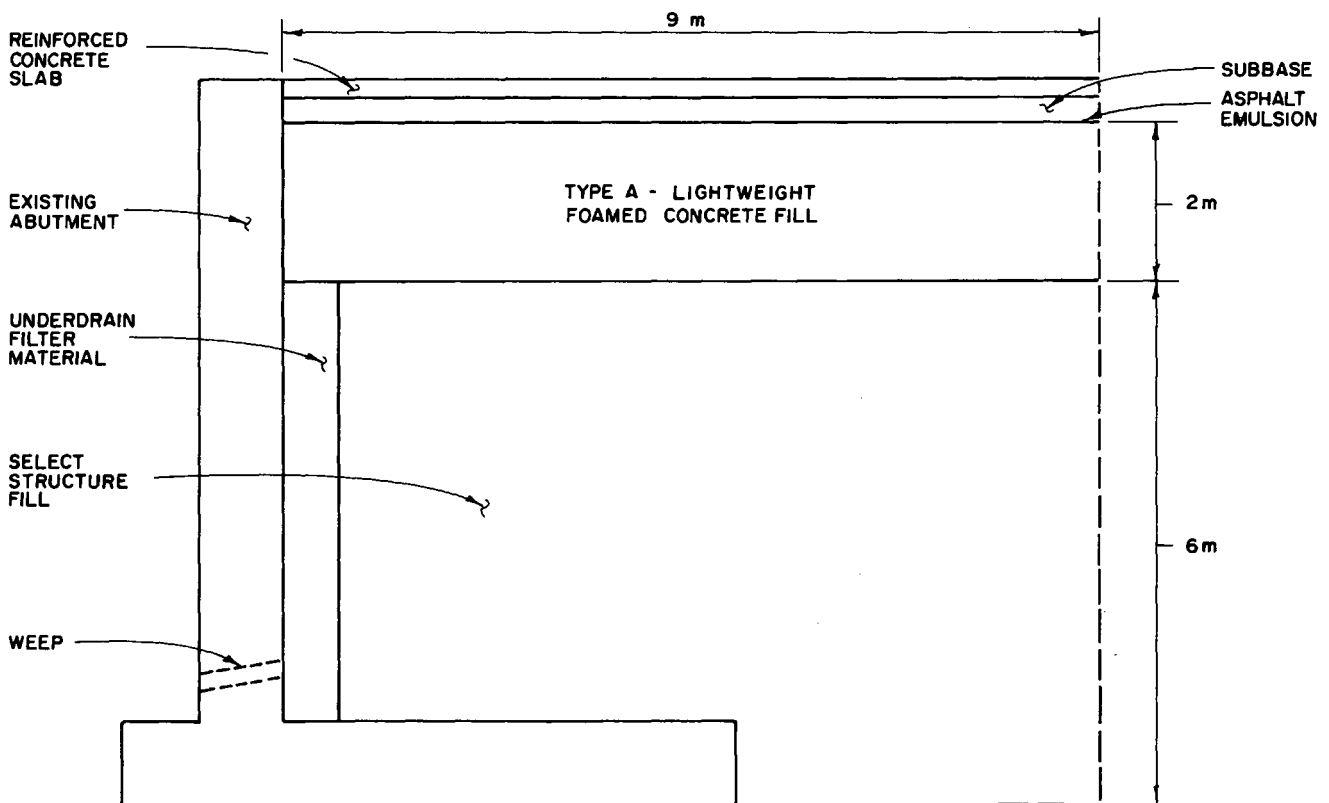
LFCF behind existing abutment with asphalt emulsion seal on top lift.
